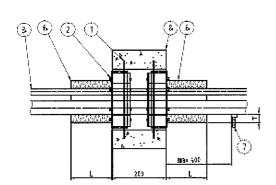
Copper pipe in mixed penetration seals in rigid wall, made with use of double Roxtec R seals
